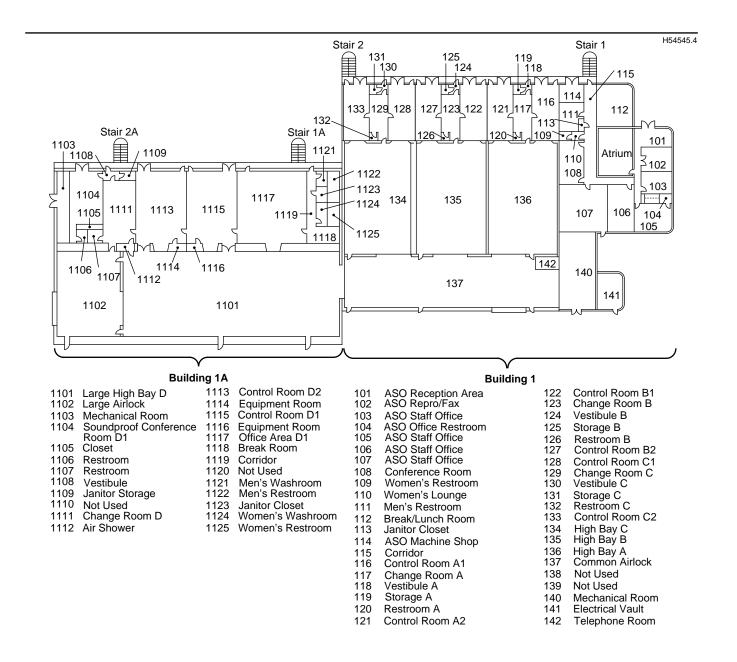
First Level Floor Plan, Building 1/1A, Astrotech
